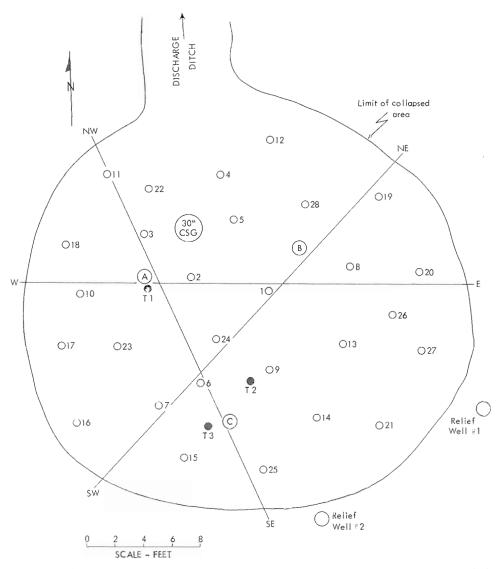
Plans of grout, observation and test-holes in crushed-rock fill.
